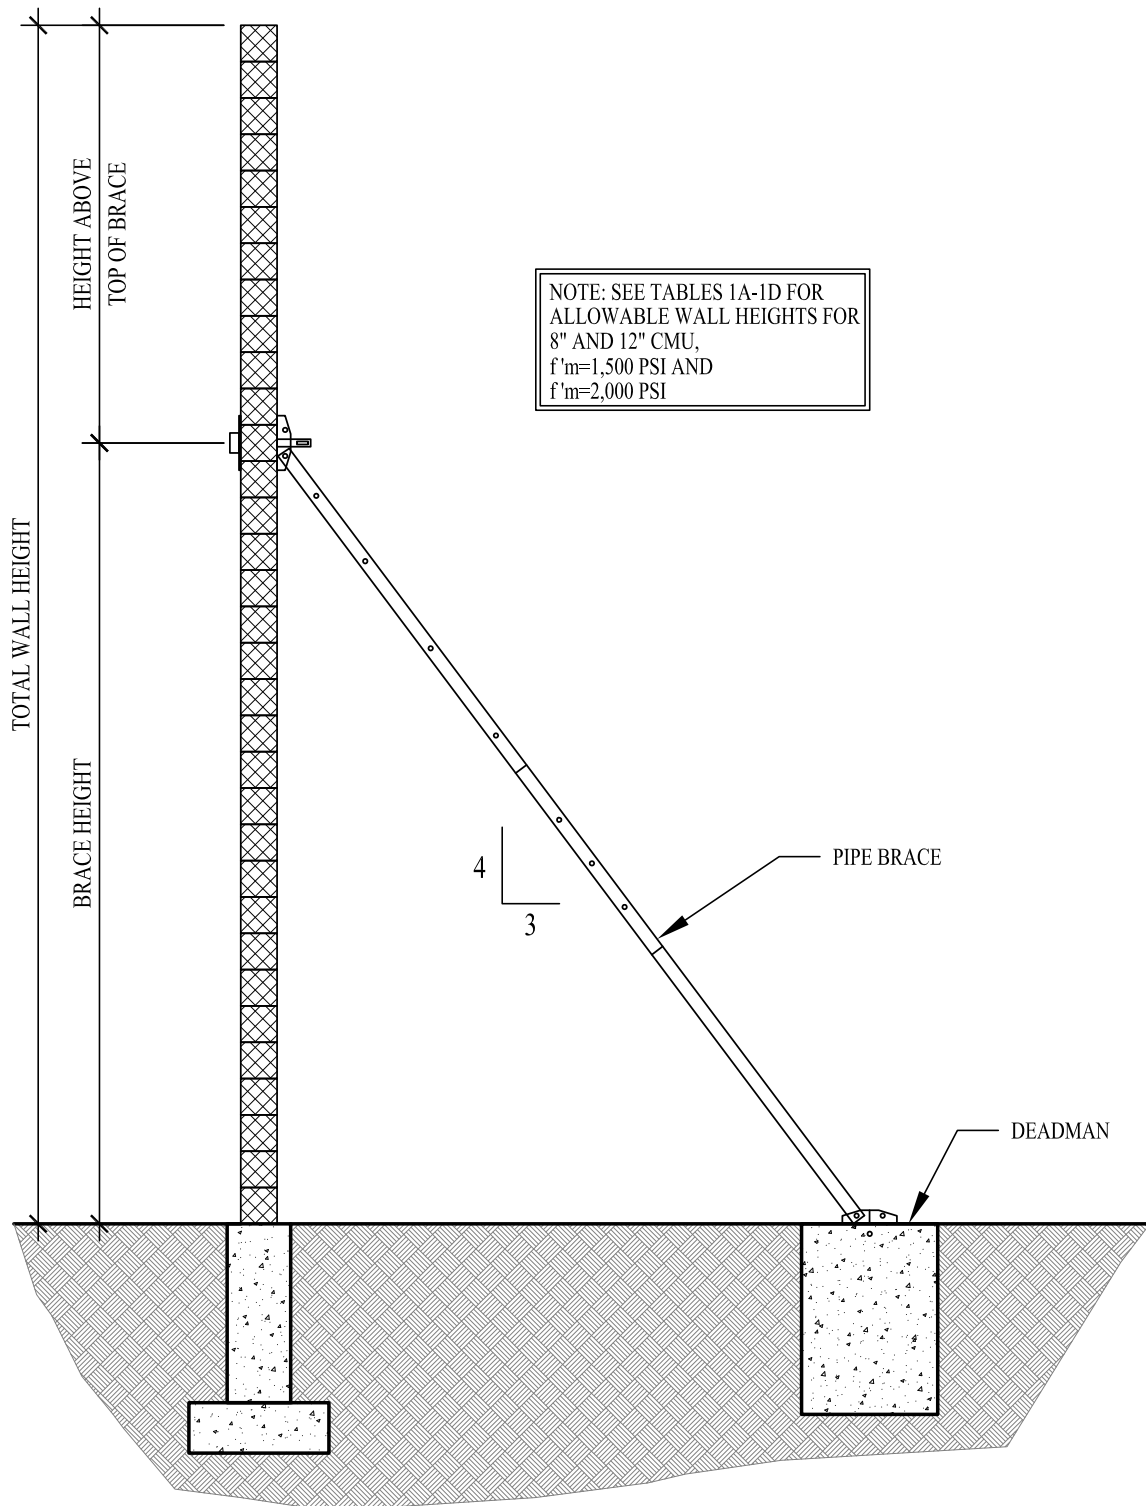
EXTERNALLY BRACED WALL SECTION
